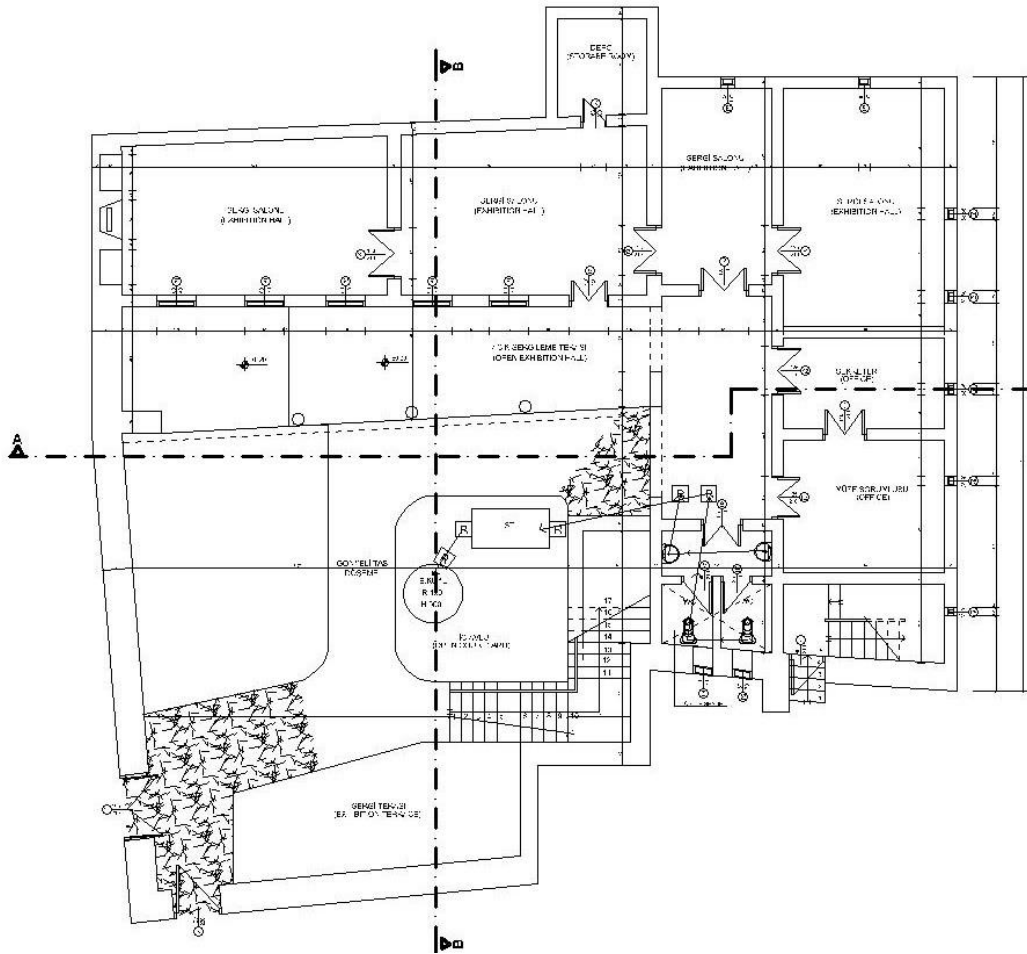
; Ground floor plan of the male part of the Chimney House (Department of Antiques and Museums)
